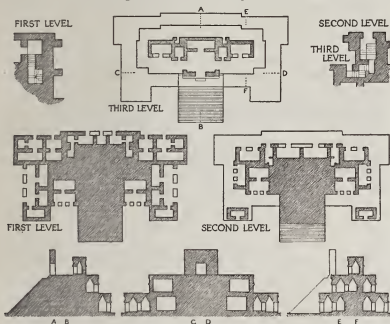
Elevations and Groundplans of the Ruin Known as Santa Rosa Xlabpak, Yucatan. Spinden, 1913. I
